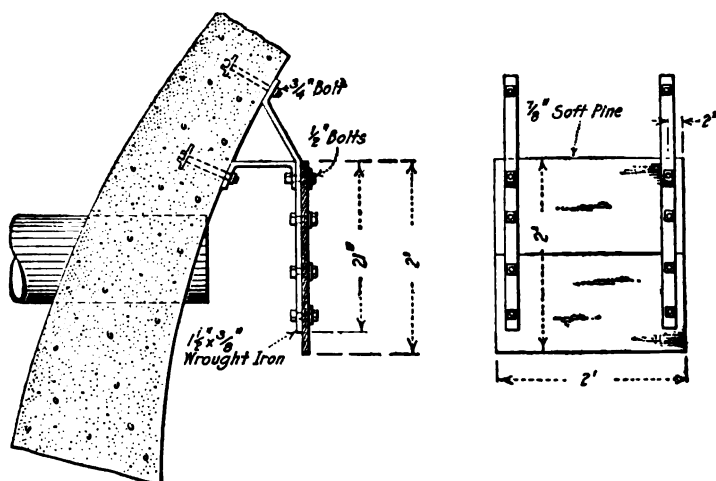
Baffle plate in front of inlet pipe of settling basin.
